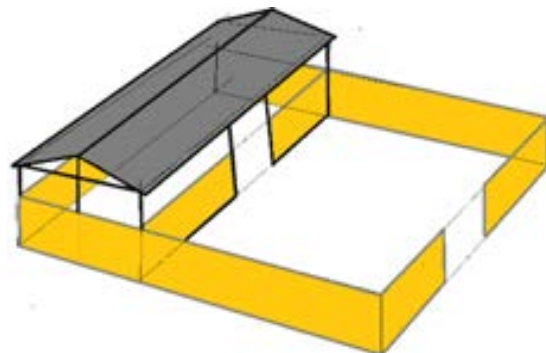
Typical architectural design of a community-based waste collection and treatment centre
